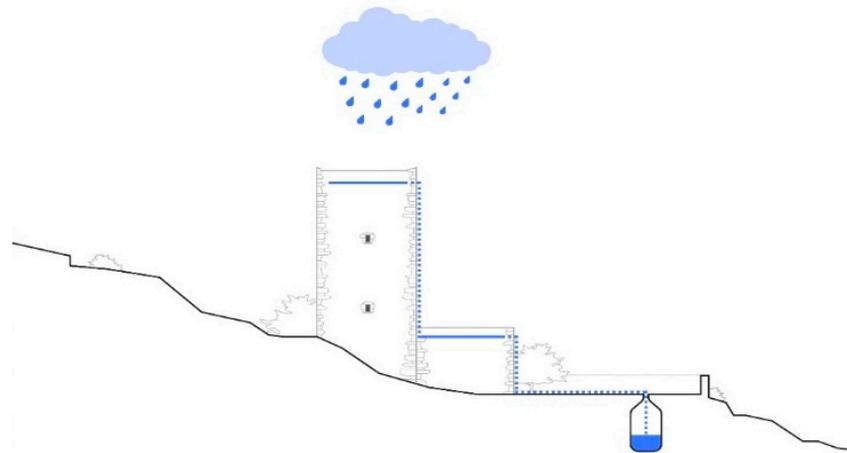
Cross-section of a typical traditional tower-house complex with its cistern in West Mani.
